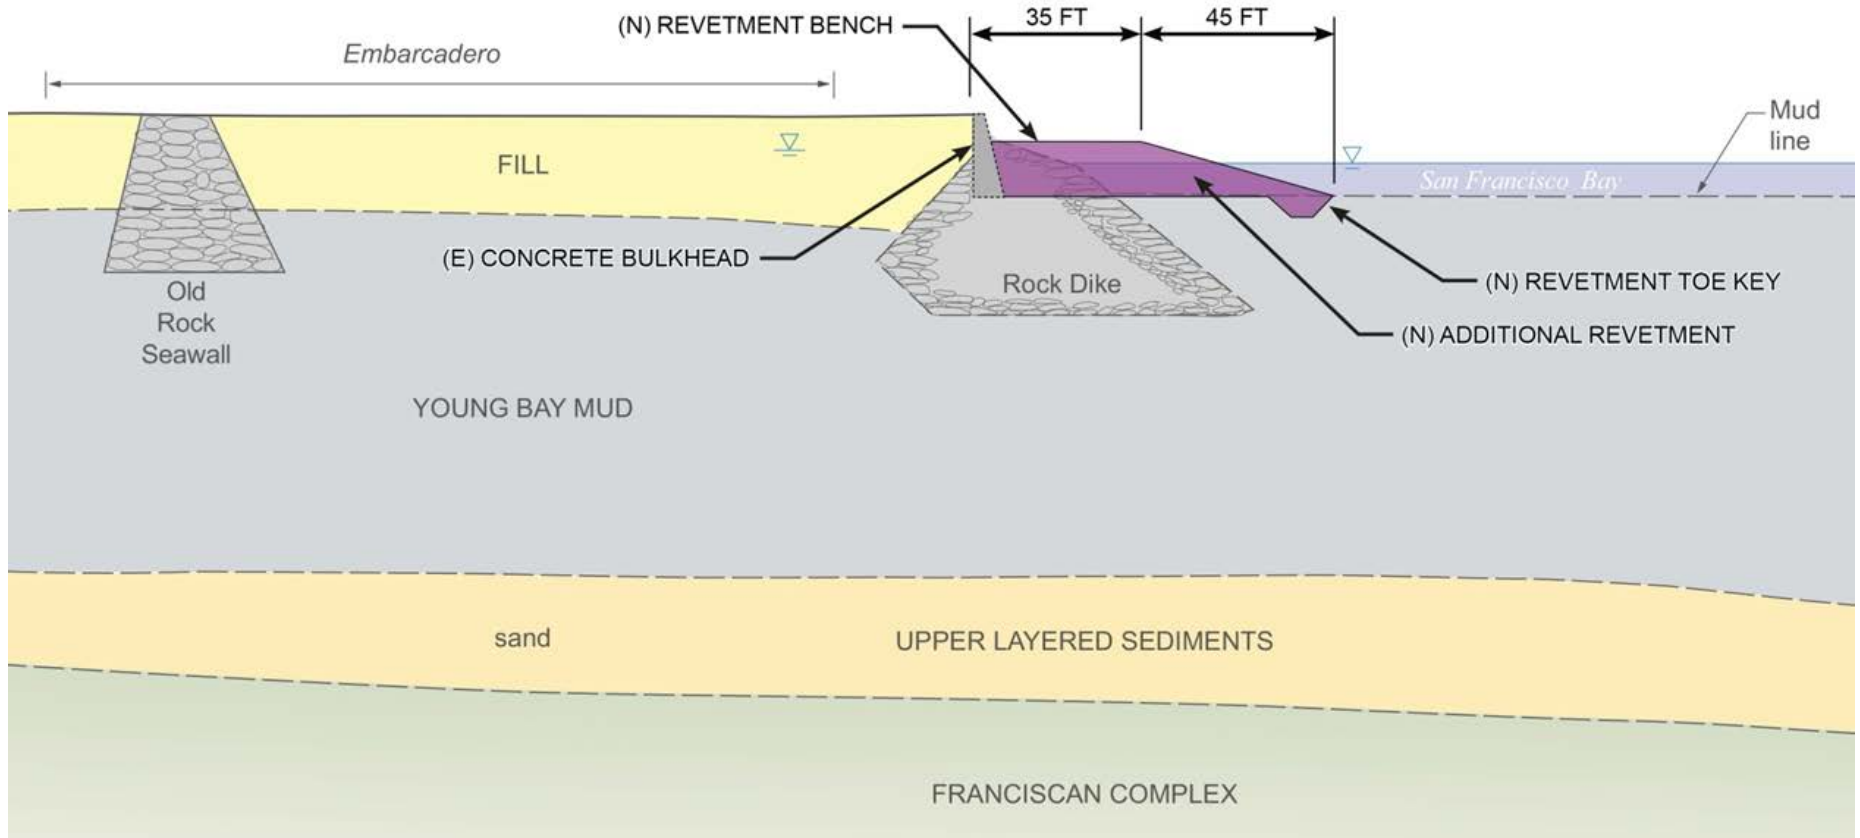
Bulkhead Wall Retrofit - Revetment Bayside
